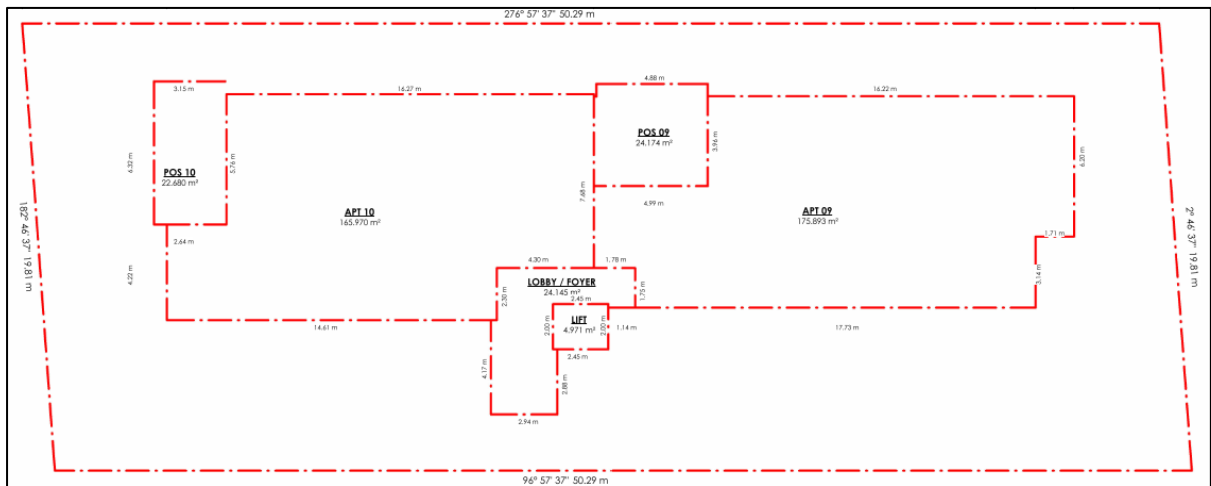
(Above) Proposed upper (second) floor plan of subdivision. Source: Application documents.
